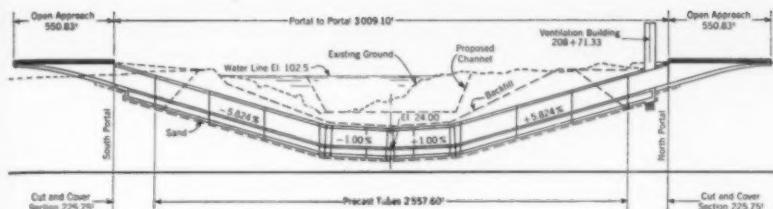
Main section of Baytown Tunnel is being built by trench and precast method. Cut-and-cover method is used for 225.75-ft section at each end.
